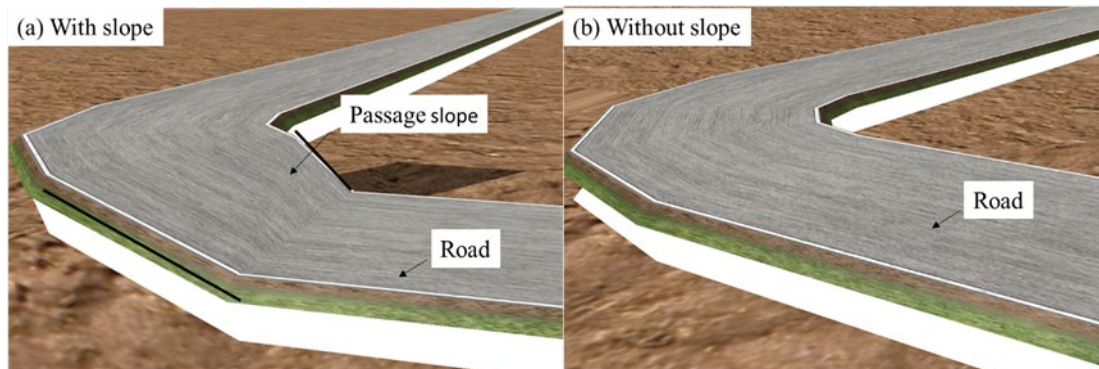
(a) Road surface with a slope; (b) Road surface without a slope.
